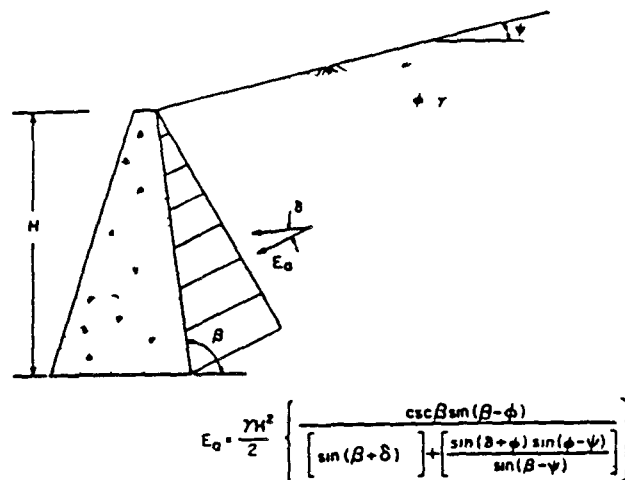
Closed-form solution for active earth loading, rough wall sloping wall face and backfill
